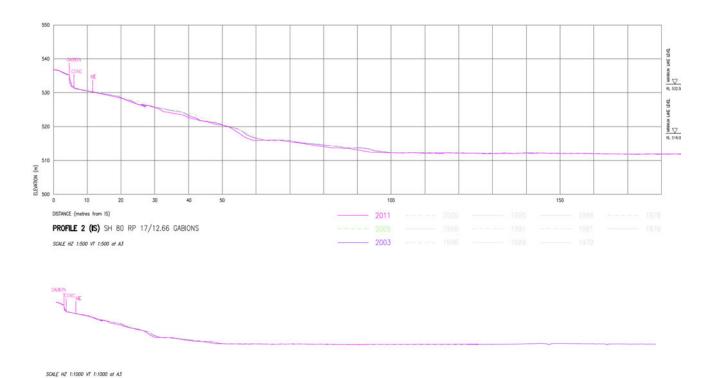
Lake shoreline survey profile surveyed from the gabion retaining wall (Source: Opus report).
